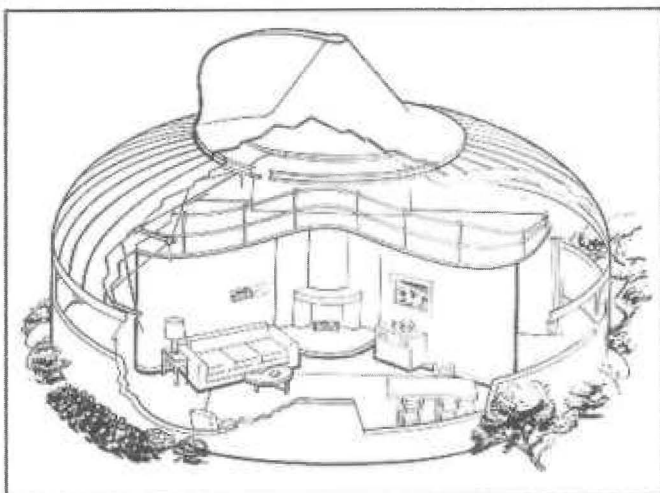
Cutaway line drawing of Dymaxion Dwelling Machine, 1945. (Copyright 1994 Allegra Fuller Snyder. Courtesy Buckminster Fuller Institute, Santa Barbara, California.)
